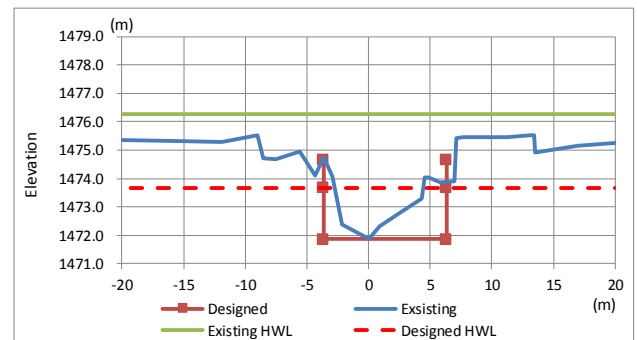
Designed Cross Section at Bridge No.2 (Bhikteswor Khola)
